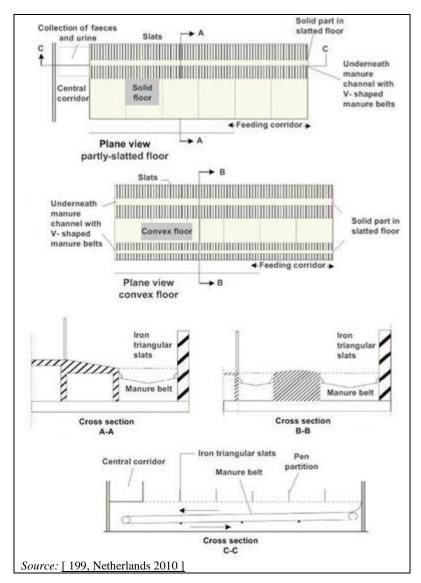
Schematic plans and sections of housing systems equipped with V-shaped belts
